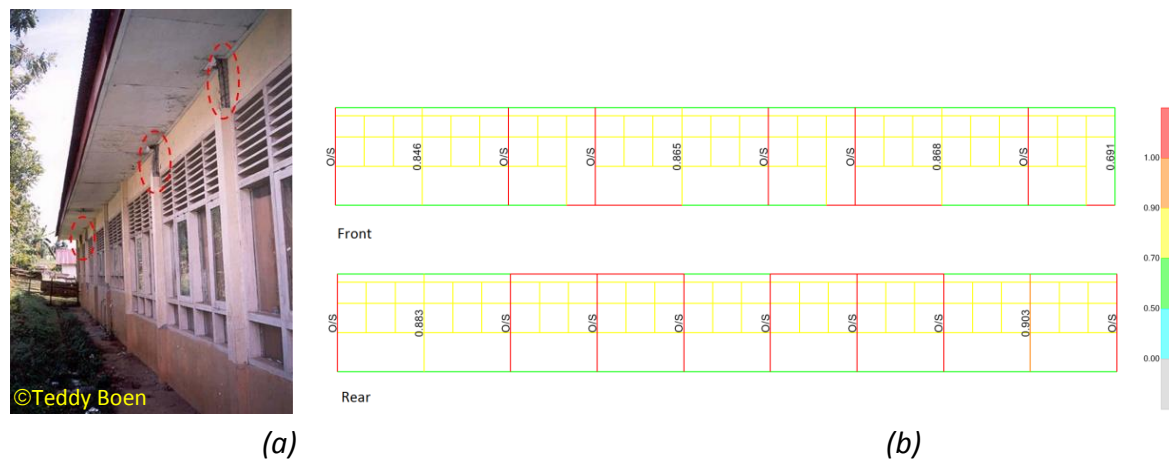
(a) Actual Column Damage; (b) P-M Column Ratio from Analysis of 3D Model – Red Color Indicates Column Damage Possibility
